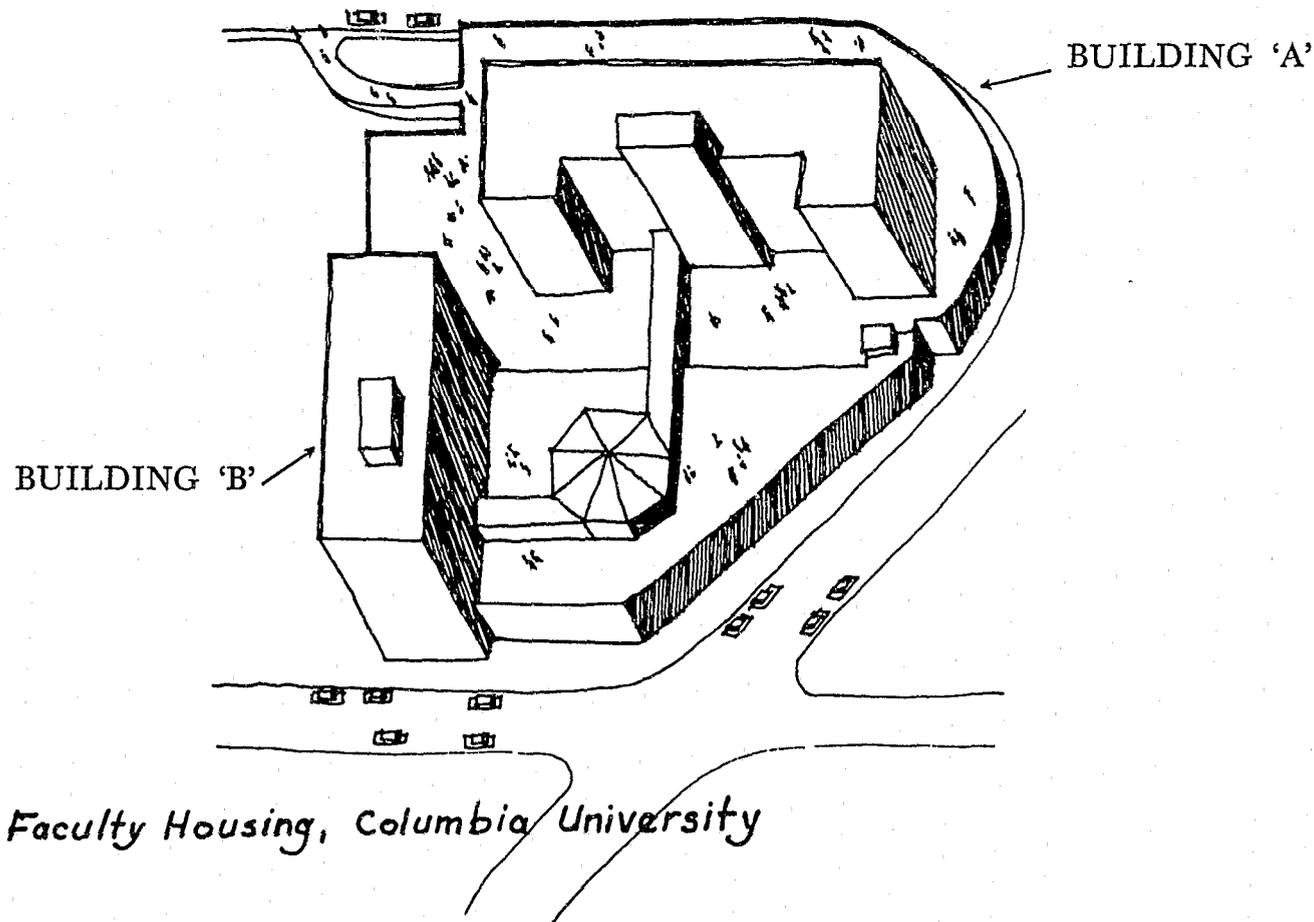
560 Riverside Drive, New York. Sketch showing roof deck of garage. 560 Riverside Drive consists of two 22-story towers on top of four stories of garage space. The roof deck of the garage serves as a recreation and sitting area for children and adults. The two buildings are connected by a glazed corridor on the garage deck level.
